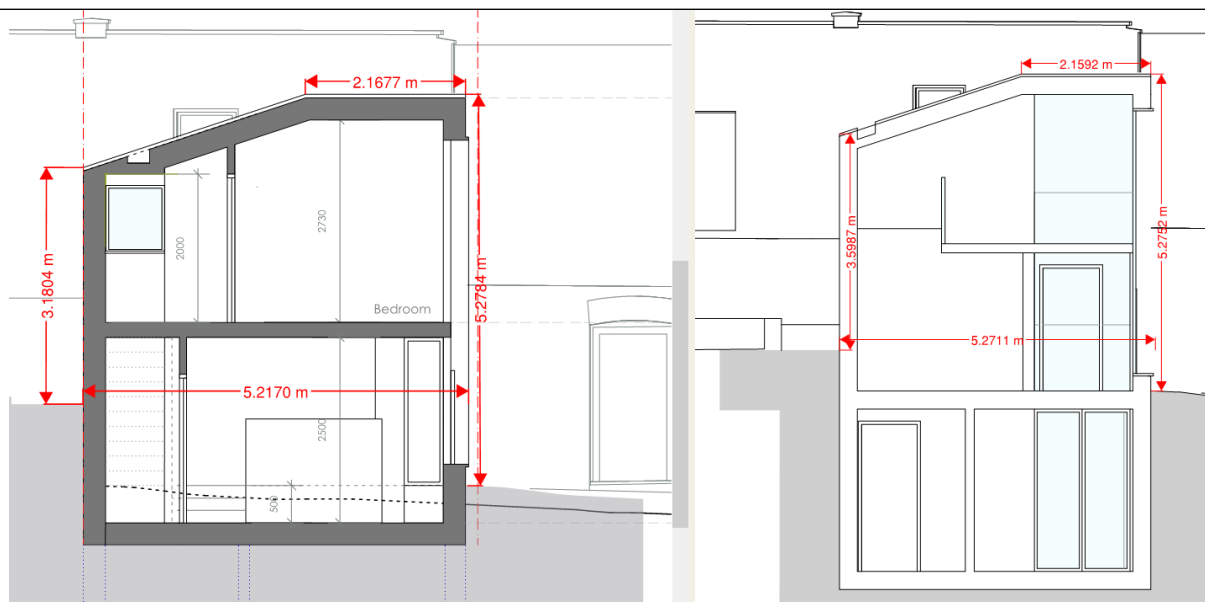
Proposed BB section (left) – Approved BB section 2015/2171/P (right) (Note: 0.46m lower height now proposed)
